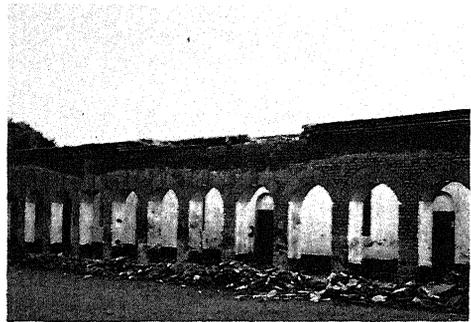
Madarsa Hamedia, Qila Ghat, Darbhanga (Cracking of walls and roof)
